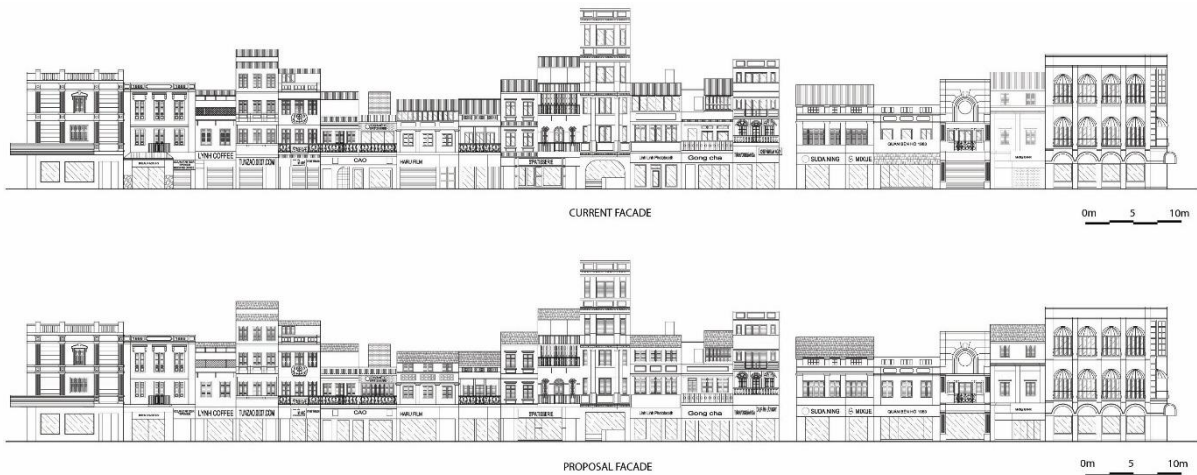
Current façade and proposal façade of Hang Khay Street. Drawn by authors
